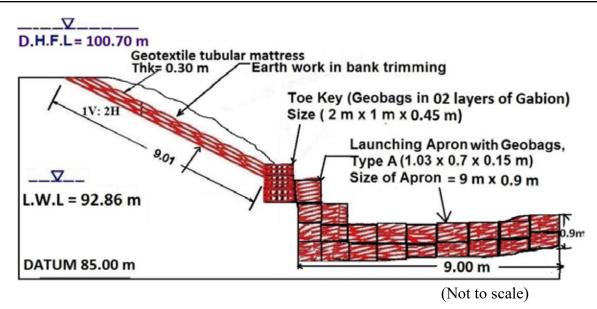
Typical cross section of bank revetment and launching apron (North Lakhimpur, W.R. Division, Assam, 2015)
